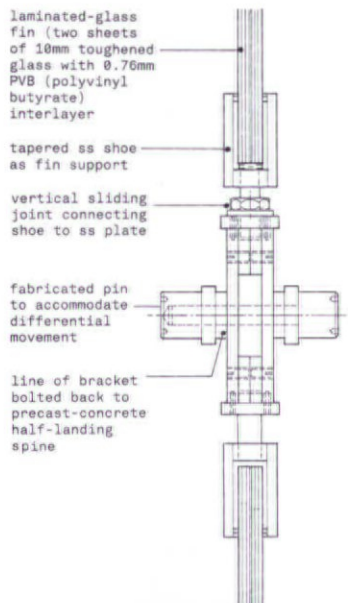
DETAIL SECTION AT GLASS WALL AND LANDING AND PLAN OF GLASS FIN CONNECTION
